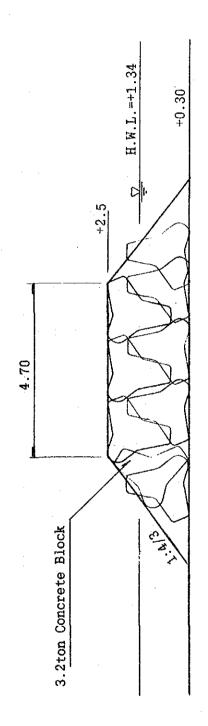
Typical Section of South Coast : East Breakwater (S=1:100)
